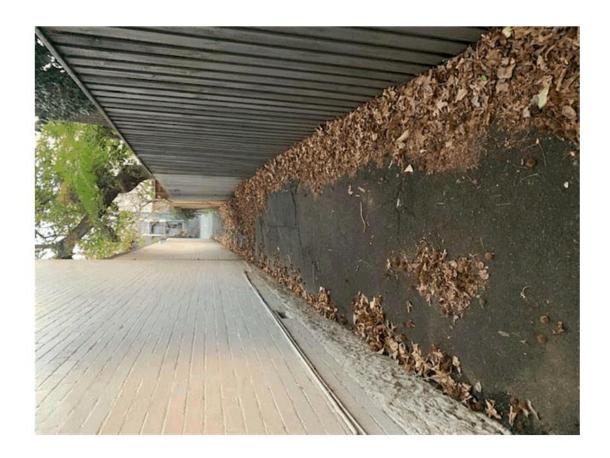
below. Kerb inlet pit designed to catch laneway flow. Looking across Lawson St
